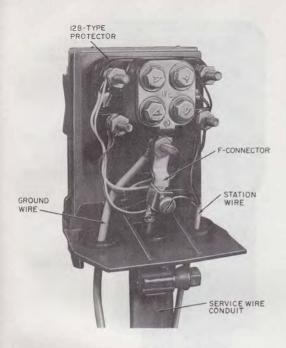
305A2 Protector Mounting Installed on a Protector Mounting Post
